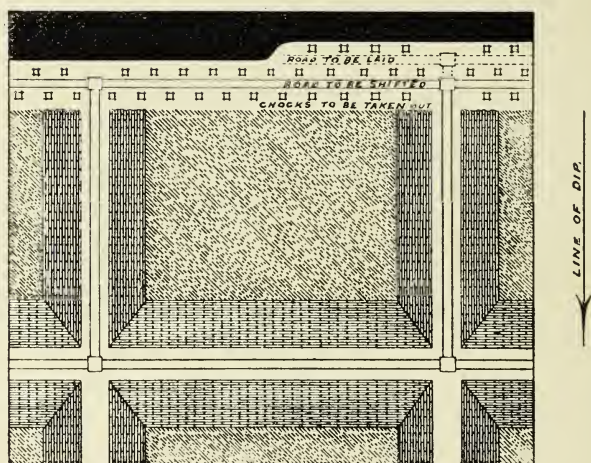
PEMBERTON COLLIERY, NEAR WIGAN, LANCASHIRE. PLAN SHOWING LONGWALL FACE IN THE ORRELL FIVE-FOOT SEAM, WITH PACKS, CHOCKS, AND ROADWAY ALONG FACE.
